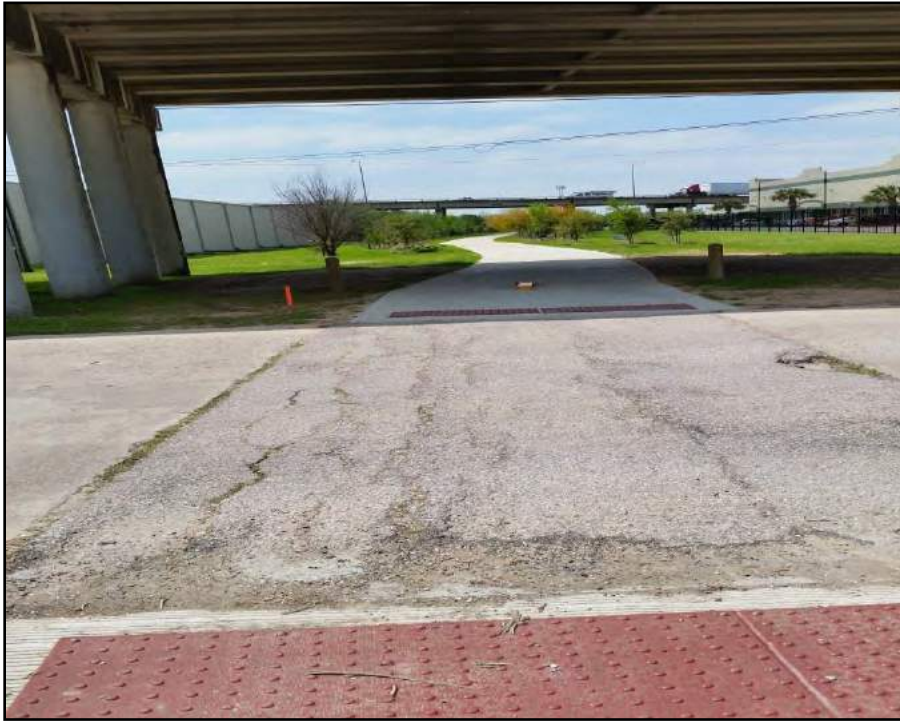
Heights Trail underneath both Shepherd Bridge and Durham Bridge
